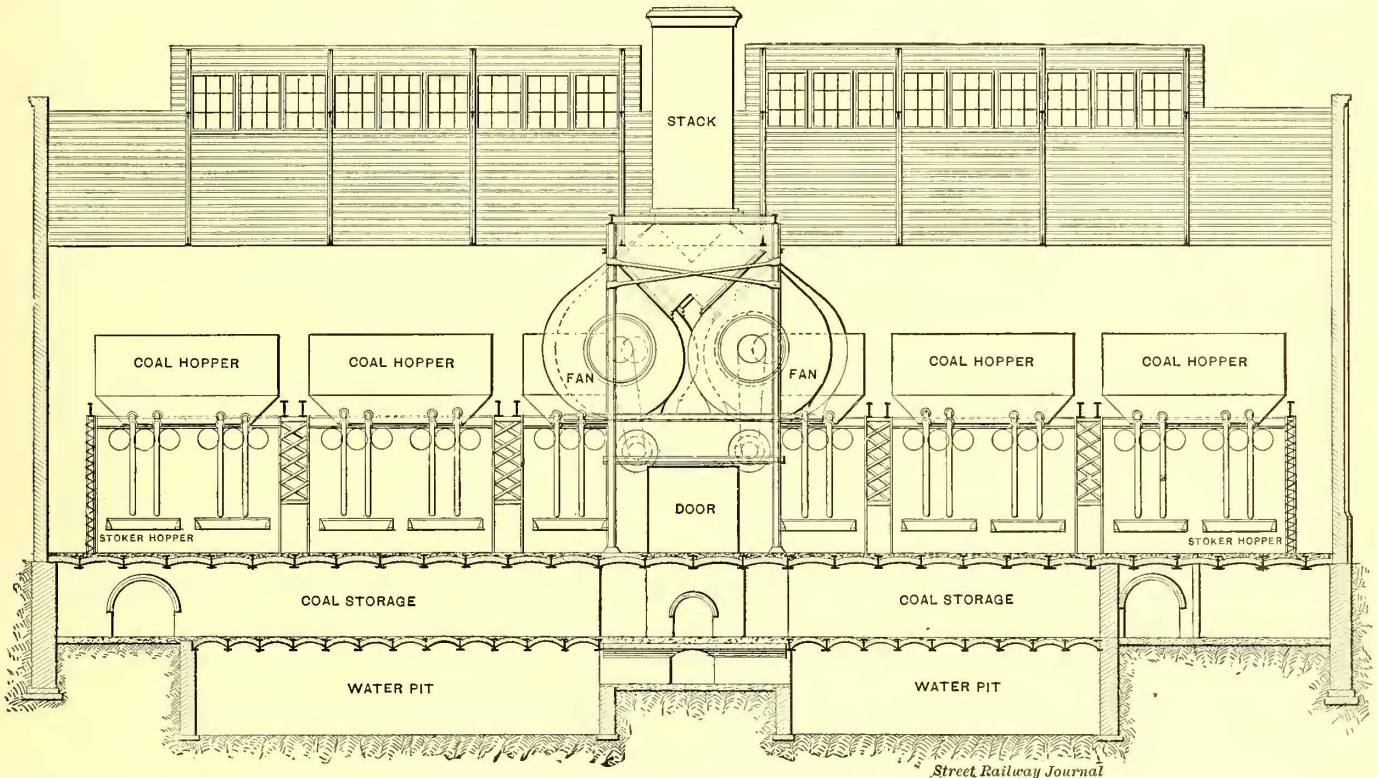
LONGITUDINAL SECTION OF BOILER ROOM—13TH STREET STATION OF PHILADELPHIA TRACTION CO.
